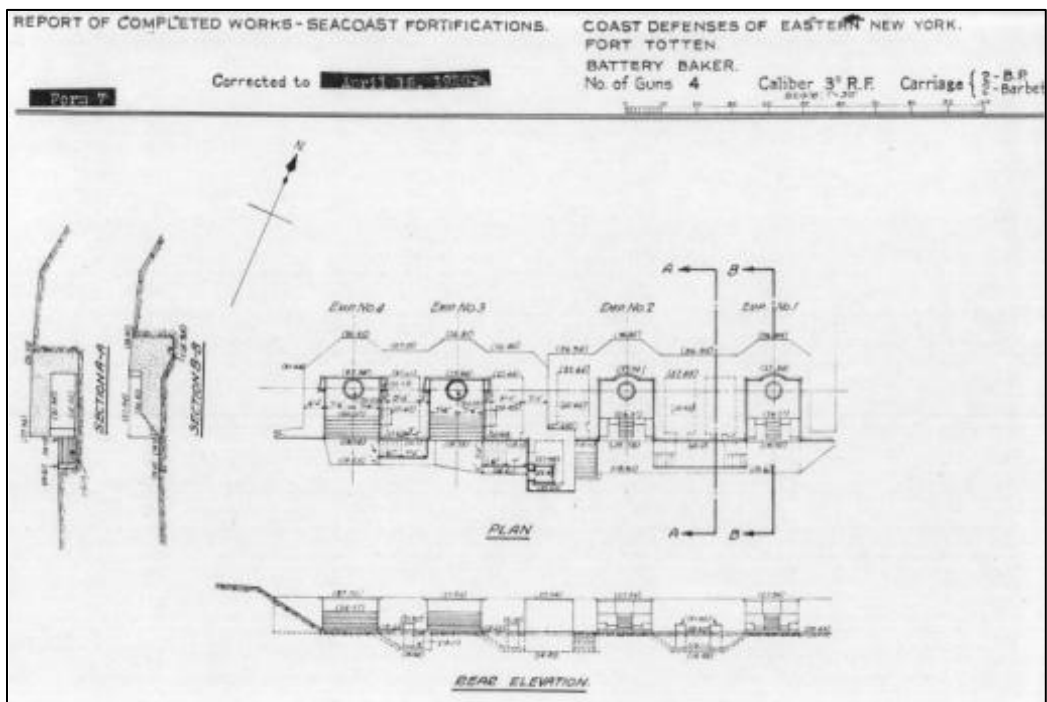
Plan, Sections and Elevation of Battery Baker, built 1899-1904 (NARA, 1920, Report of Completed Works)
